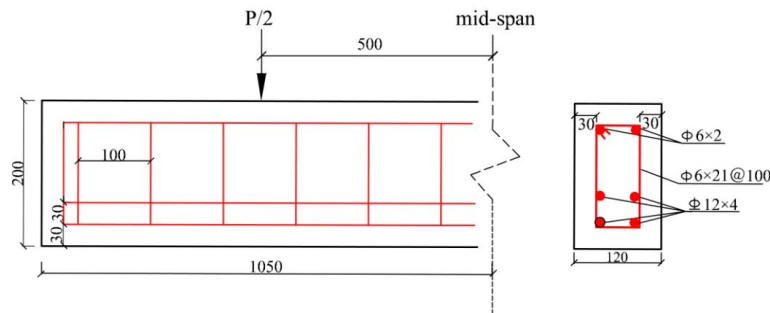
Geometry Details and reinforcement arrangement of the test beam (mm)
